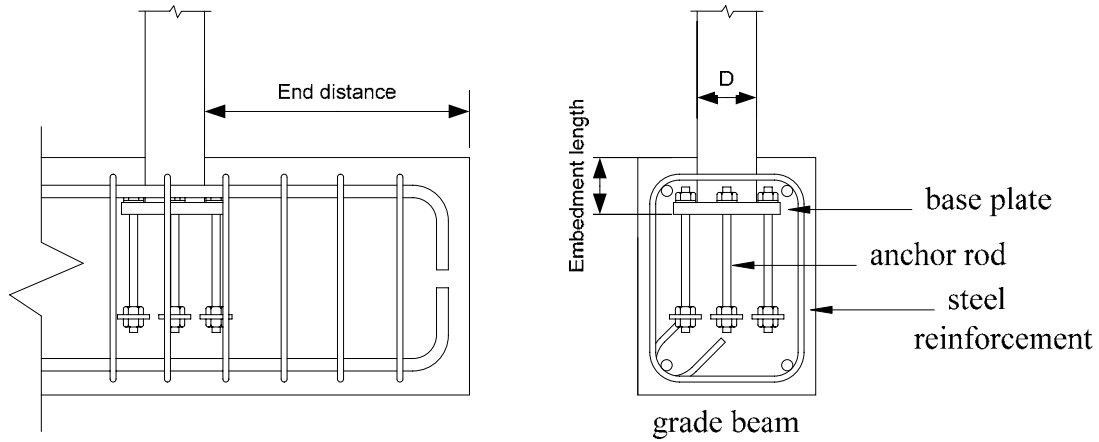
Steel column shallowly embedded in a grade beam [after (Nakashima, 1996)]
